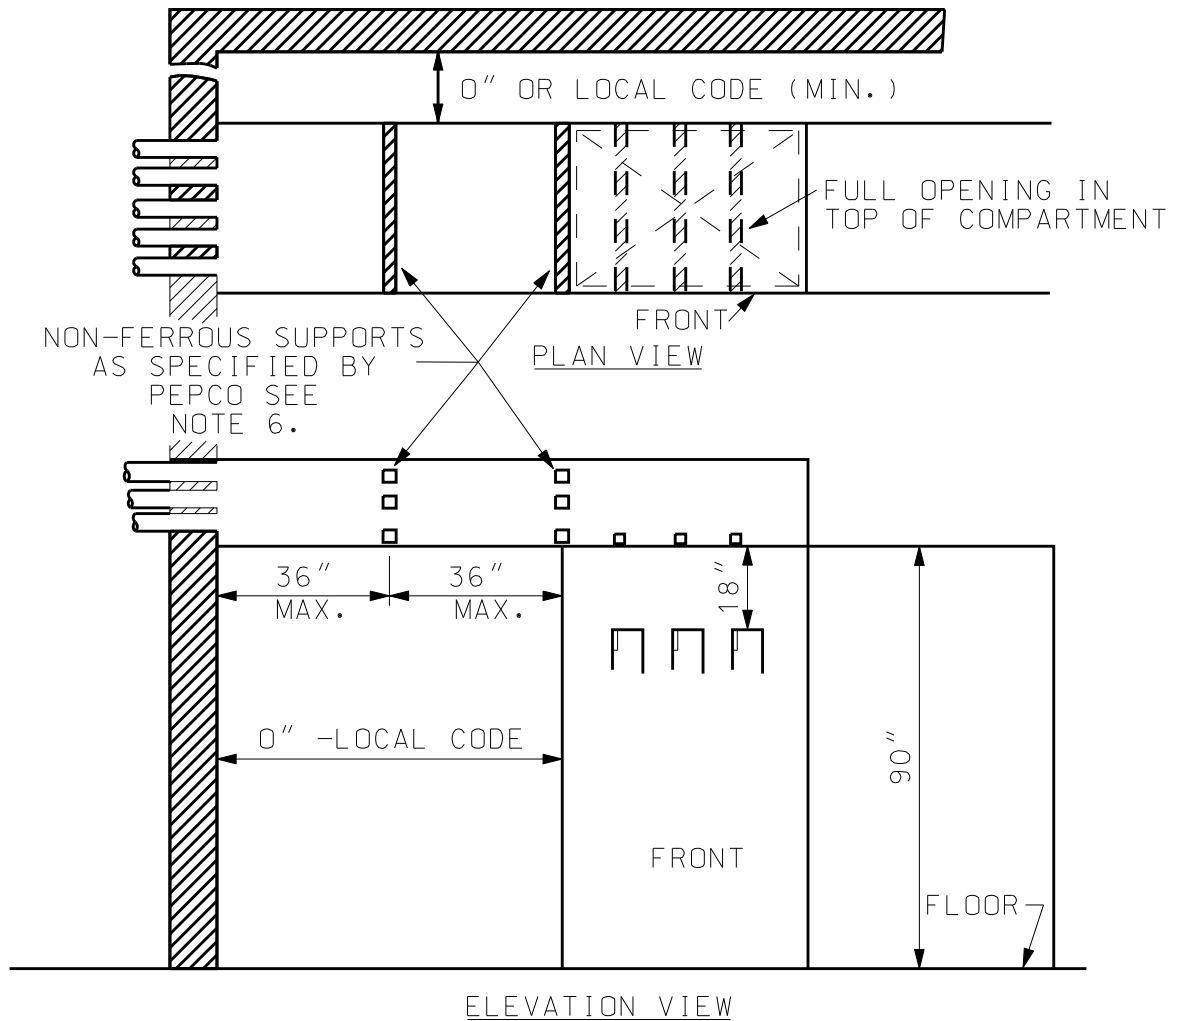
CONDUIT ENTERING FROM SIDE OF SWITCHBOARD
